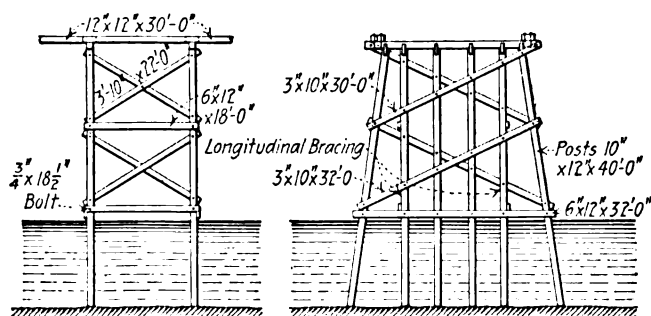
FALSEWORK TOWERS FOR THE 380-FT. DRAW SPAN
